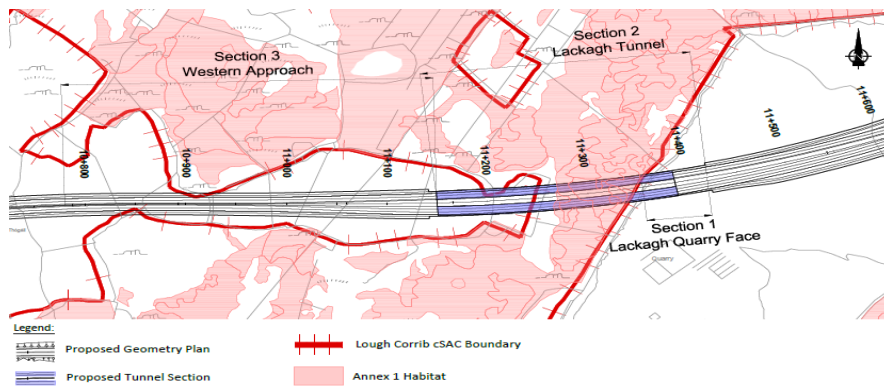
(b) - Plan overview of Lackagh Tunnel (Section 2)
